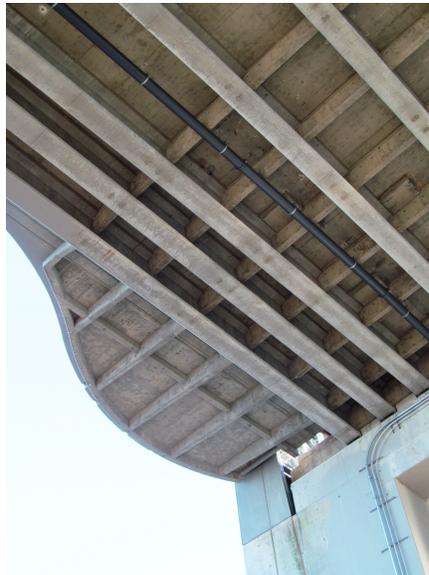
Soffit of the belvedere with the additional girder and ribs.
